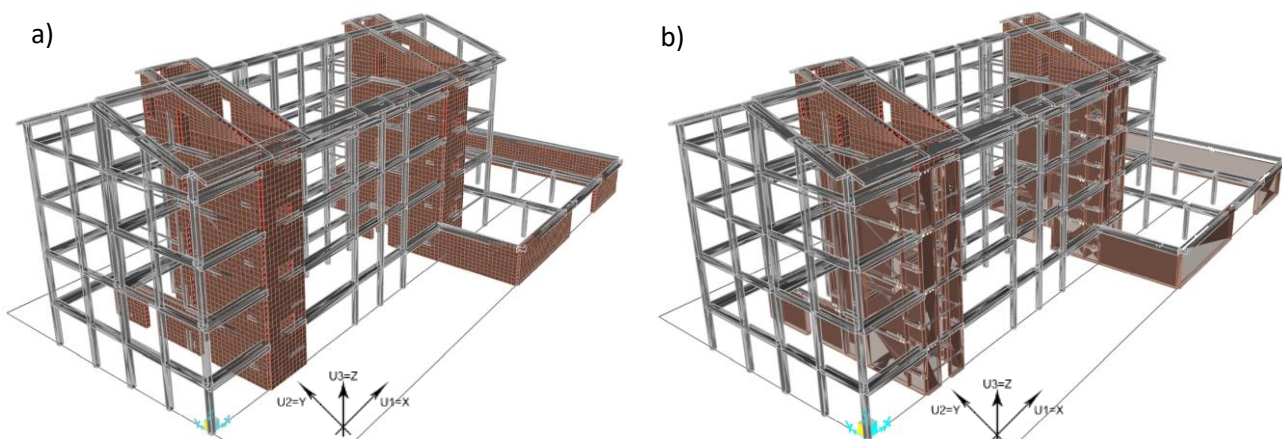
a) Finite element model with masonry walls modelled with shell elements; b) FEM with masonry walls modelled with frame elements
